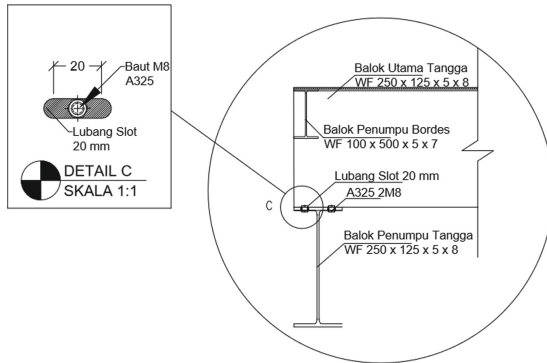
The Connection Between Main Beam and Secondary Building Beam
